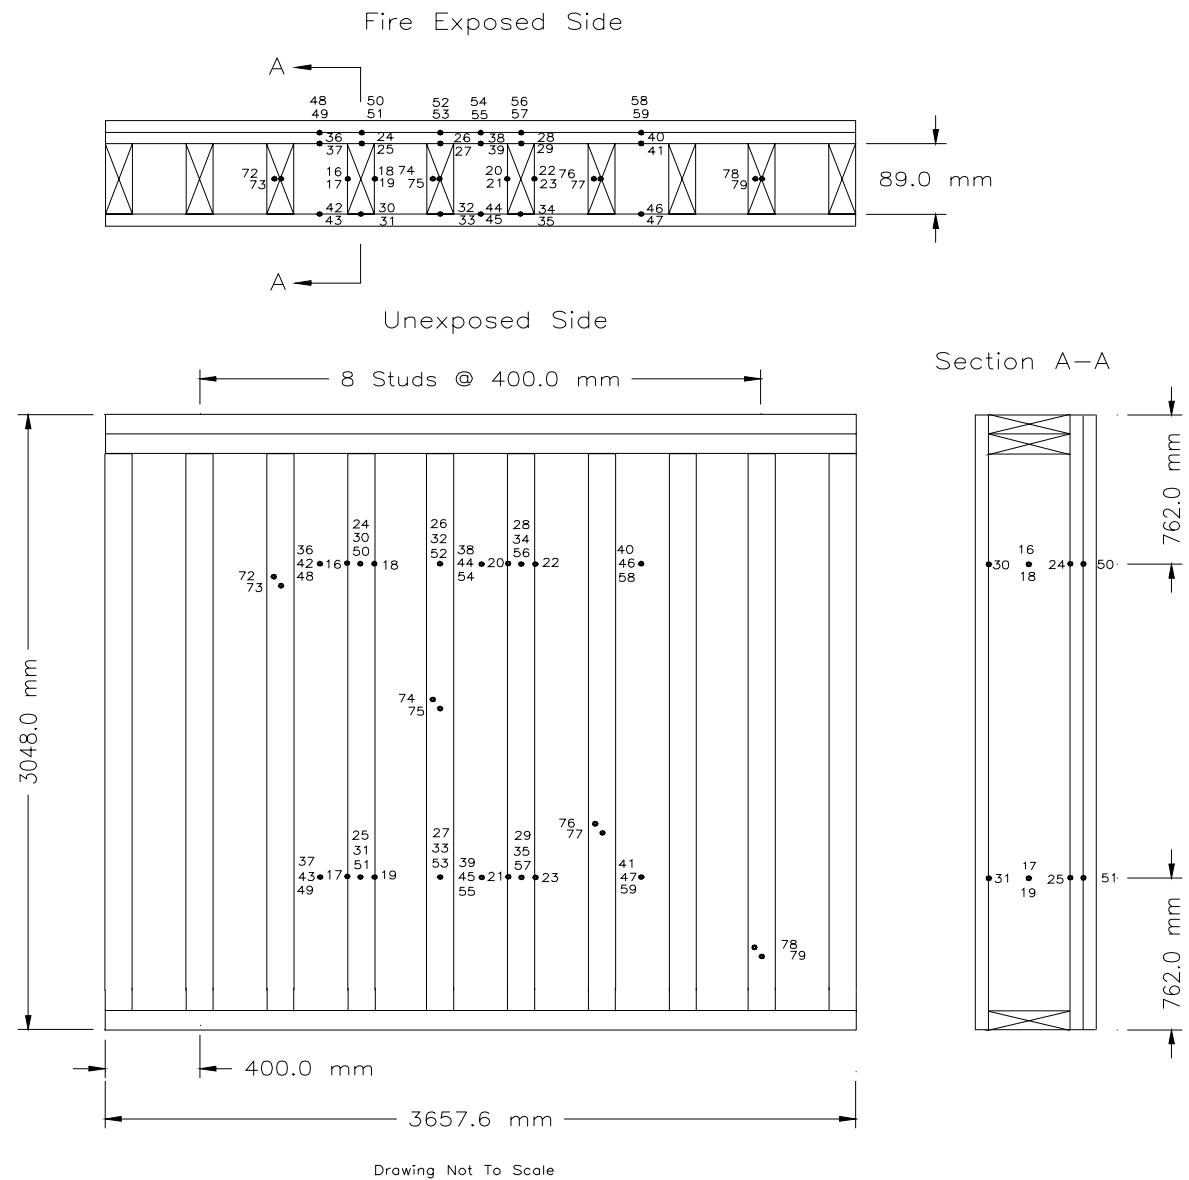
Thermocouple Locations in Wood Stud Wall Assemblies F-19 and F-20 (Shear Membrane on Fire Exposed Side)
